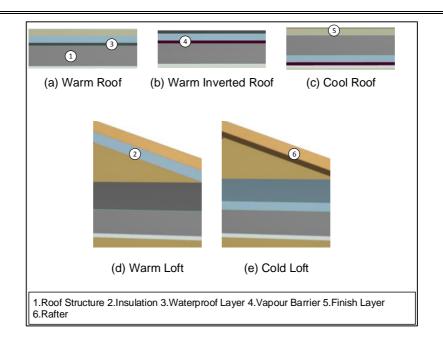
Typical insulation layouts. (a)-(c) flat roofs, (d) and (e) pitched roofs (Burton, 2012)
